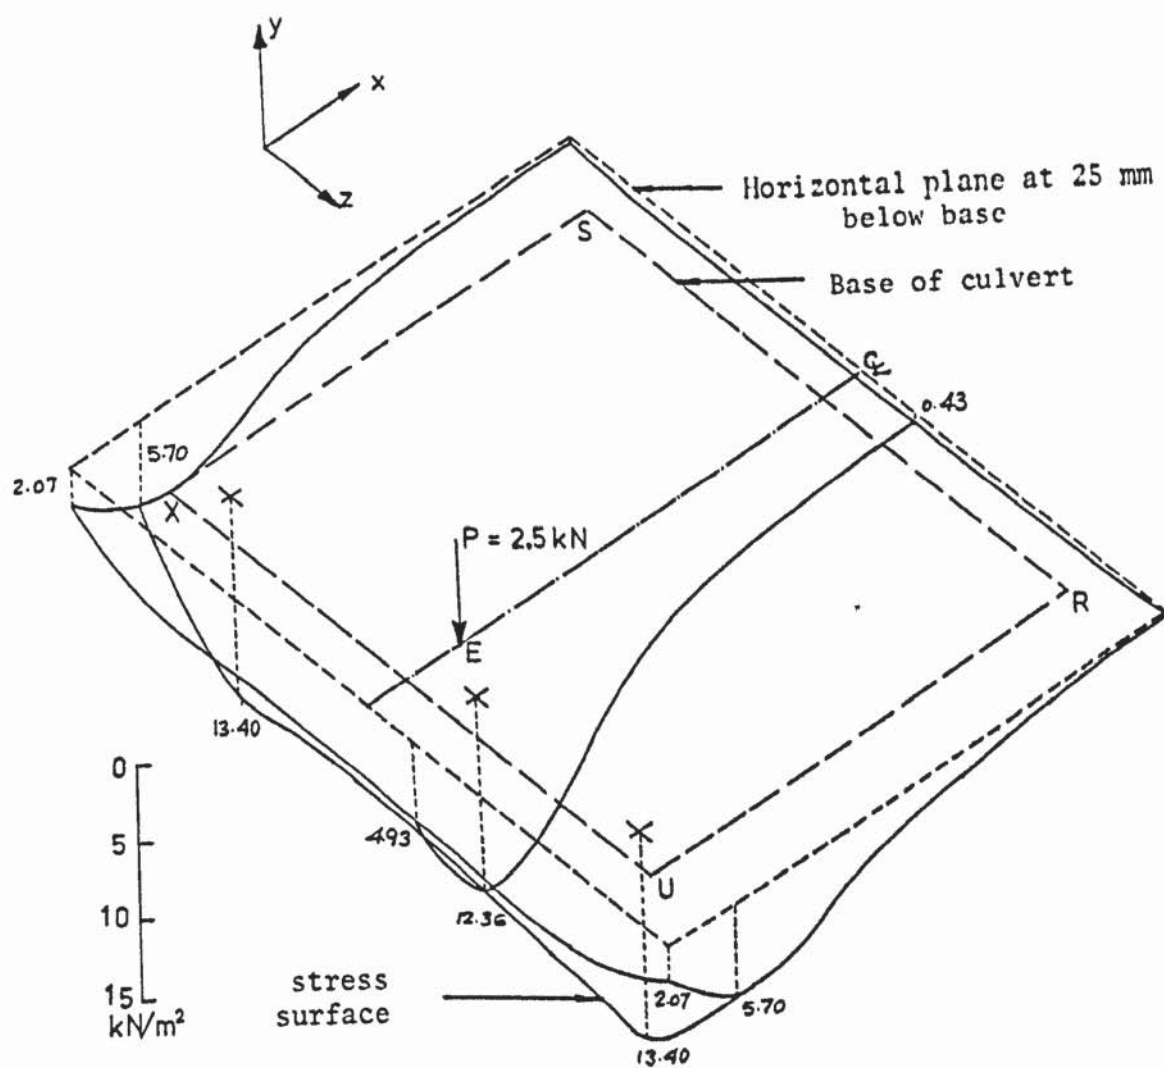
DISTRIBUTION OF VERTICAL STRESS ON A HORIZONTAL PLANE 25 mm BELOW BASE OF CULVERT FOR LOAD CASE B4
